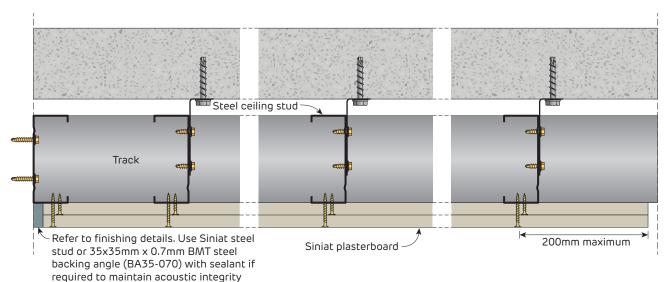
Stud Ceiling Type A4 - Fixed / Sliding Elevation
